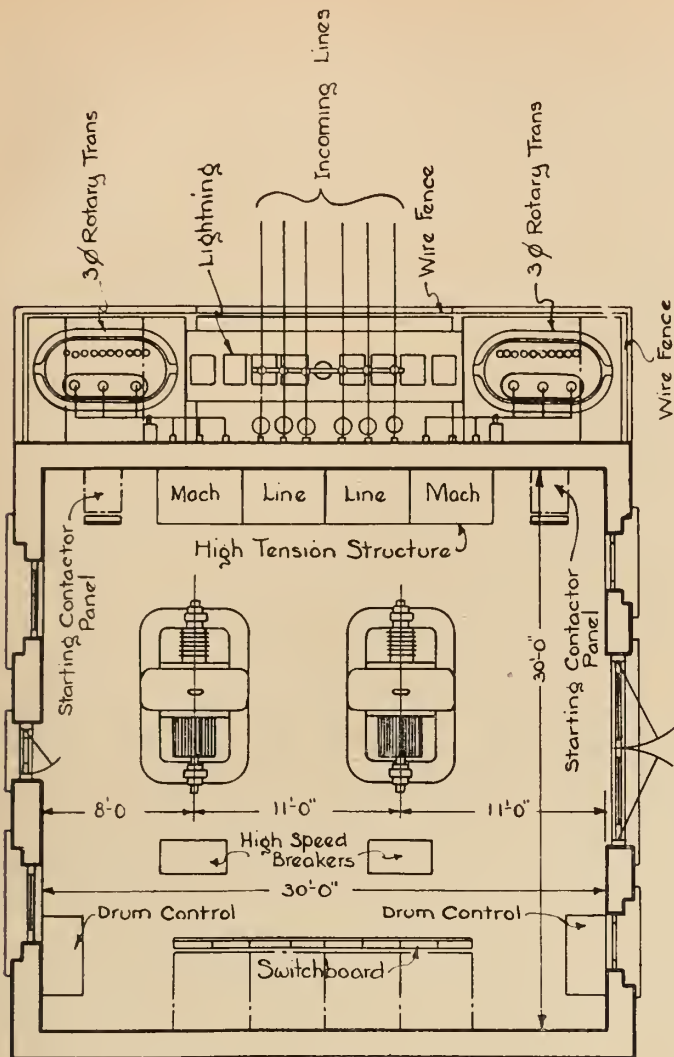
, — Main Floor Plan of Double Unit Automatically Operated Station.
